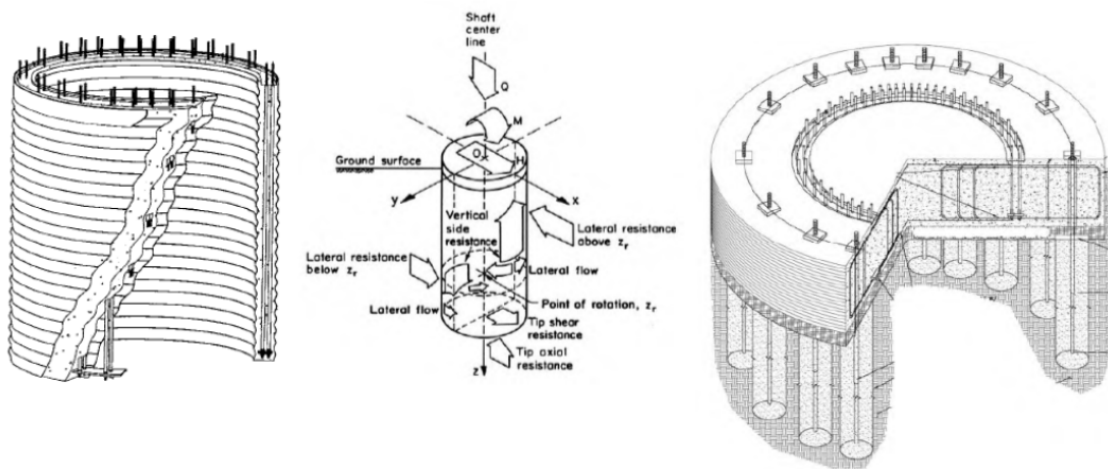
The patented Patrick and Henderson Tensionless Pier (left) and Rock Anchor or Pile Anchor foundation (right) [53]
